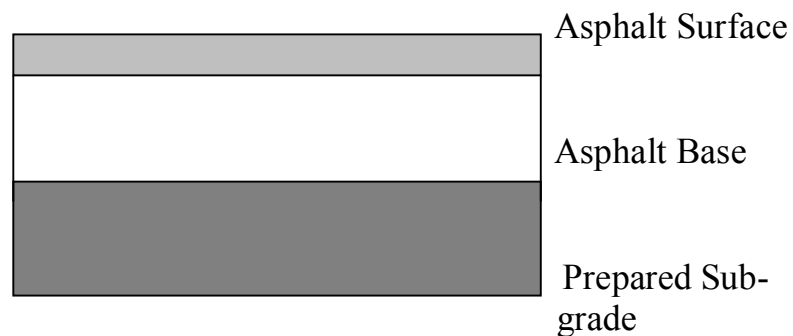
Typical Conventional Flexible Pavement Cross Section
